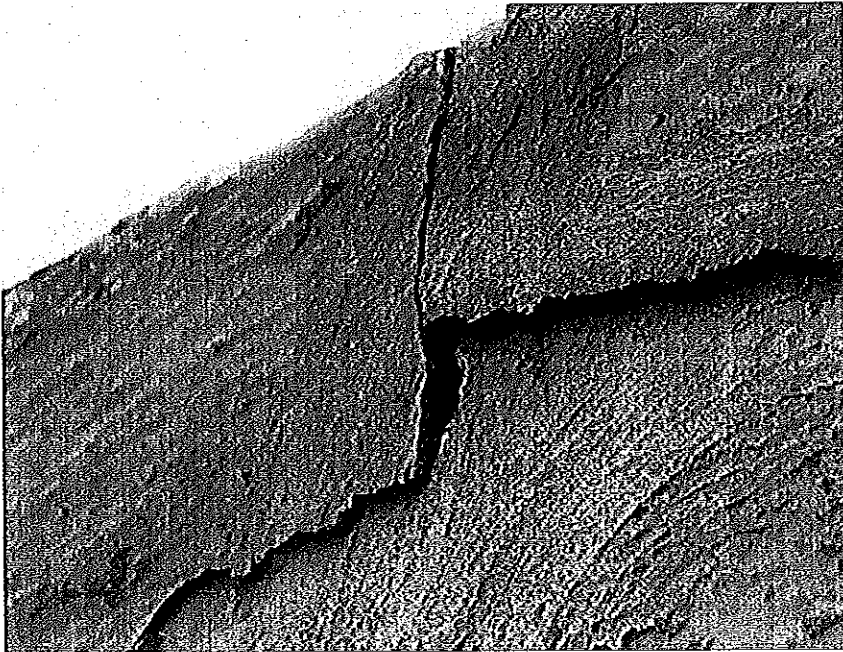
Close-up view of crack at wall-to-cap transition.
